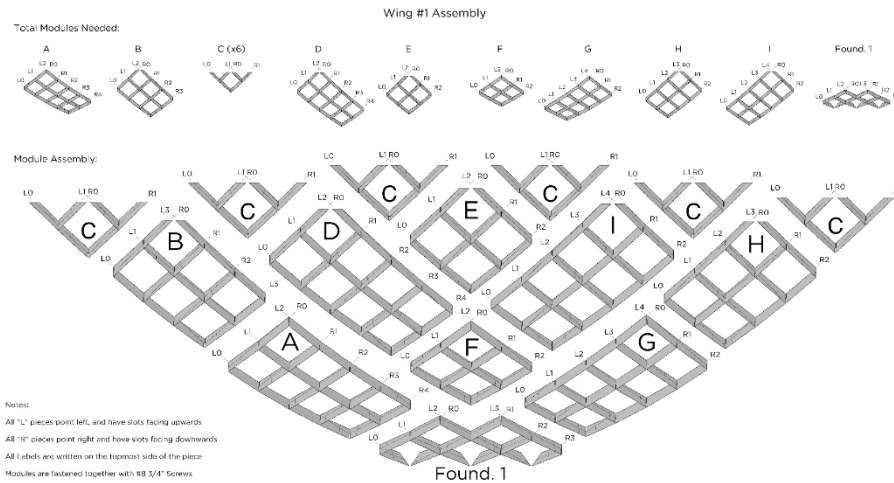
An exploded plan showing the pieces and module layout for the pavilion's central wing
